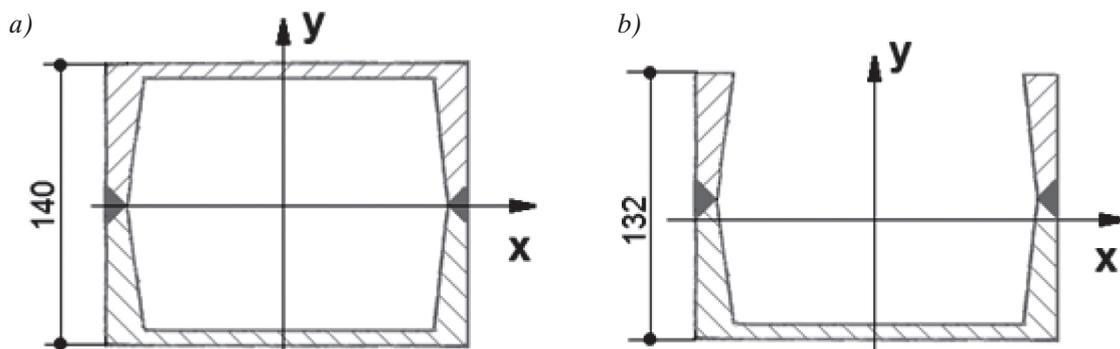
Calculation diagrams of the cross-section of the main girder in the V shaft for the girder case: a) without perforation of its walls; b) with perforation of its upper wall
